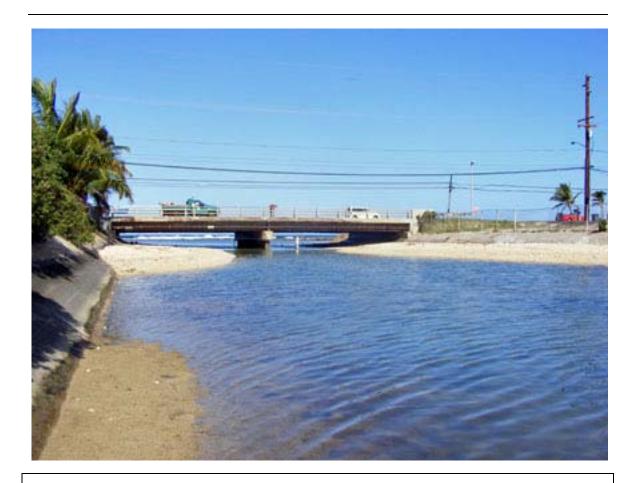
Mā'ili Stream as it flows through the concrete drainageway, under Maipalaoa Bridge, and into the Pacific Ocean.
